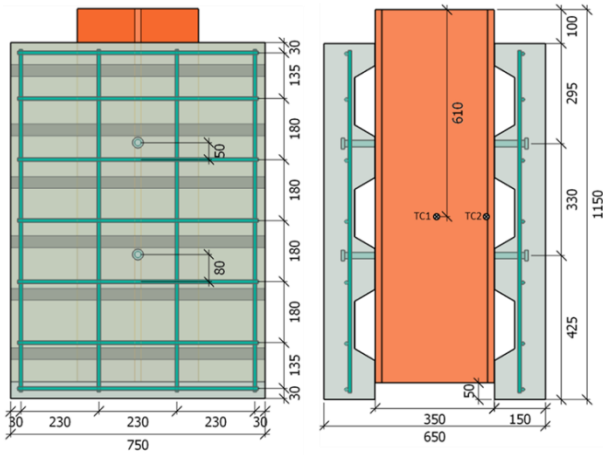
Dimensions and thermocouple (TC) locations of the push-out test specimen
